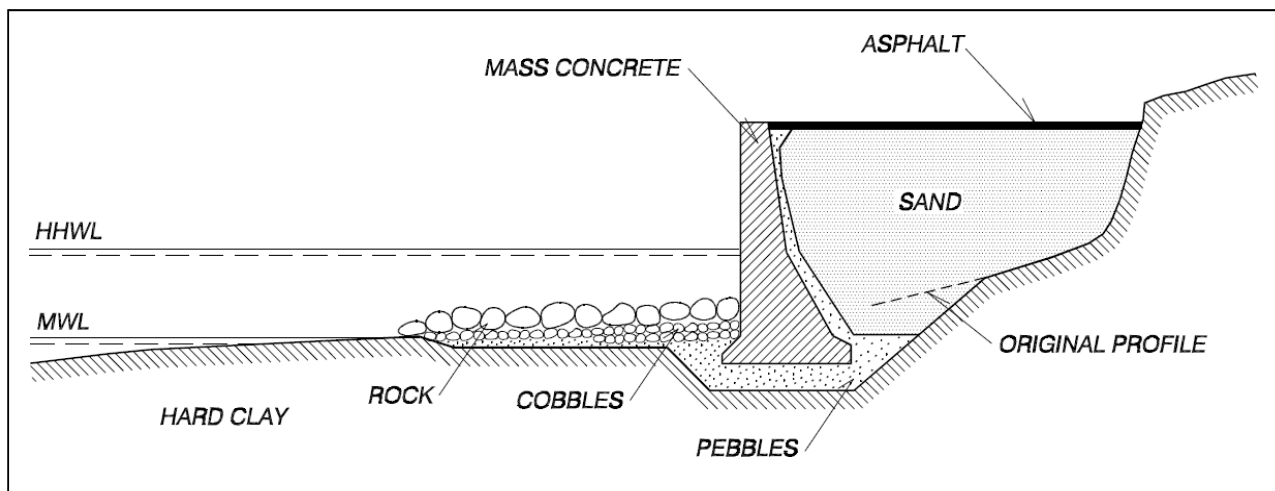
Typical section view of a vertical seawall (USACE U.S. Army Corps of Engineers 2006)
